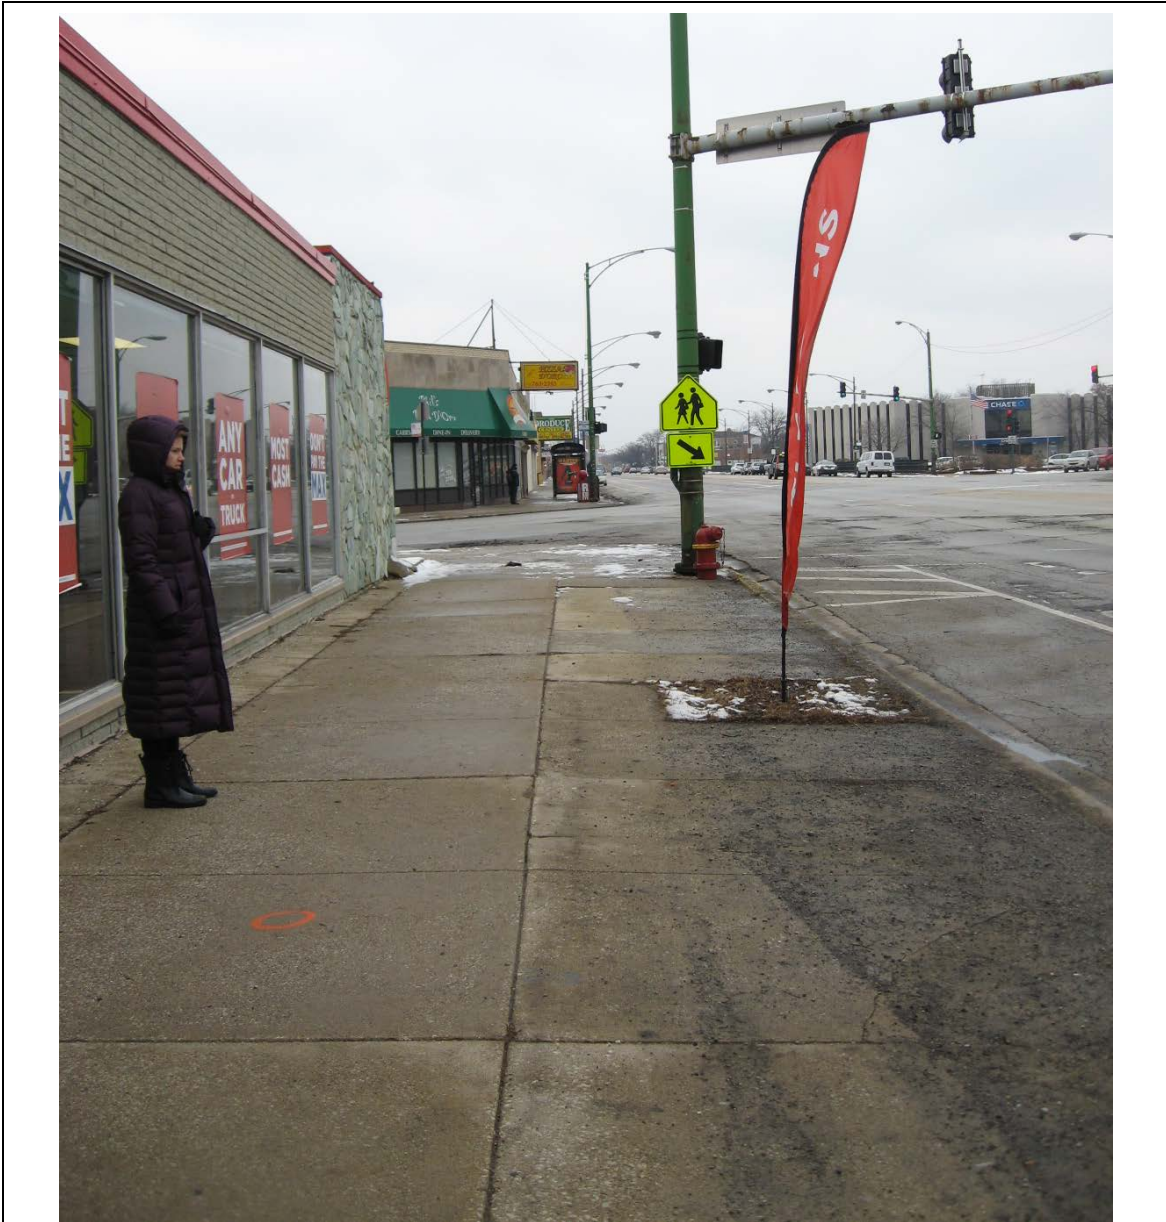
View of sidewalk adjacent to Illinois Title Loan store, the proposed location for the southbound Austin/Ardmore Station, looking northwest.
